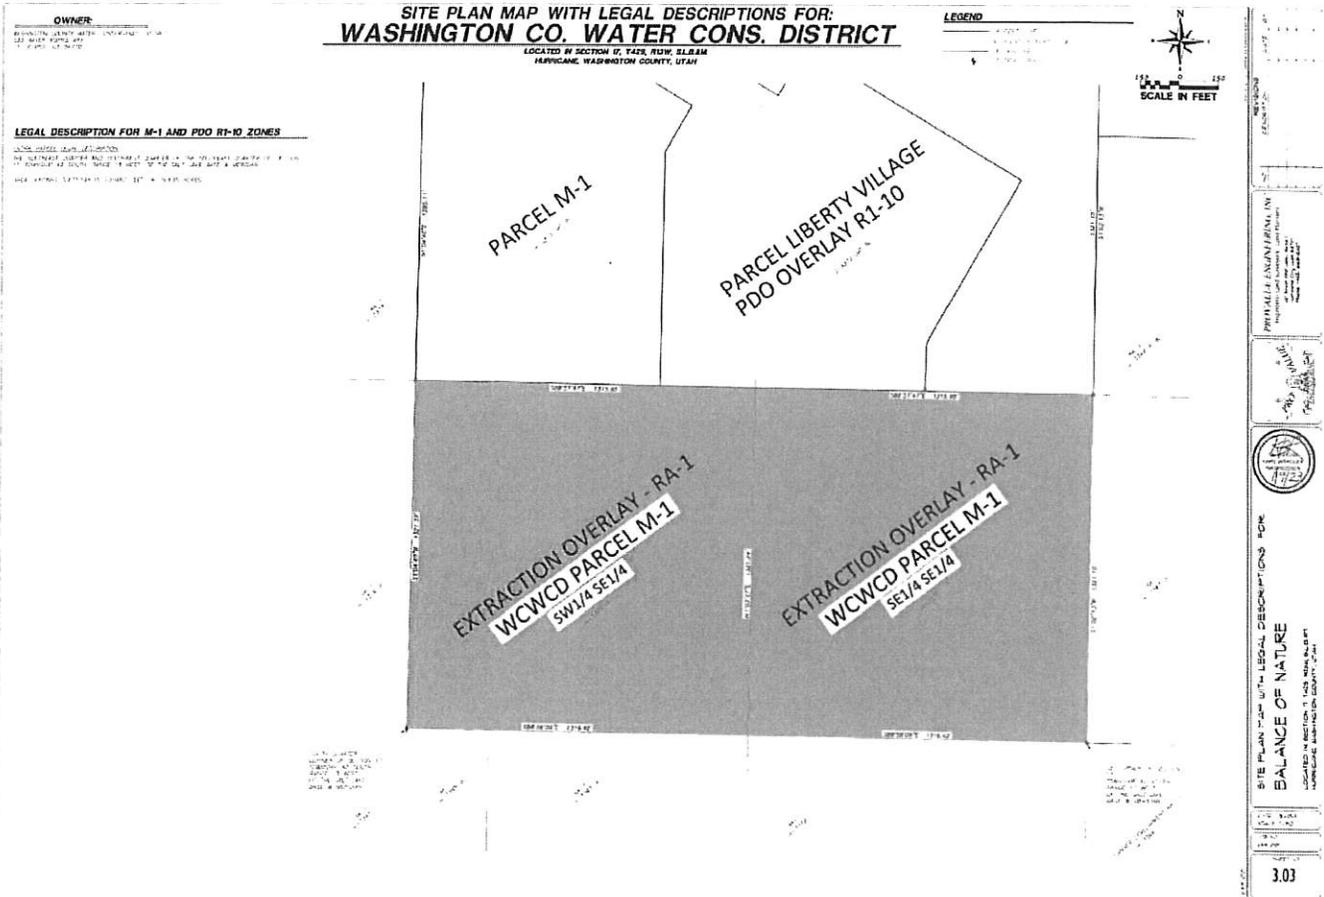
Sheet 3.03 Site Plan with Legal Description
